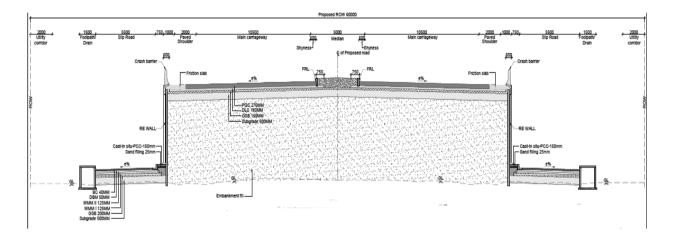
(TCS-6C) 4 Lane Underpass Cross Section With Slip Roads In Bypass & Realignment
